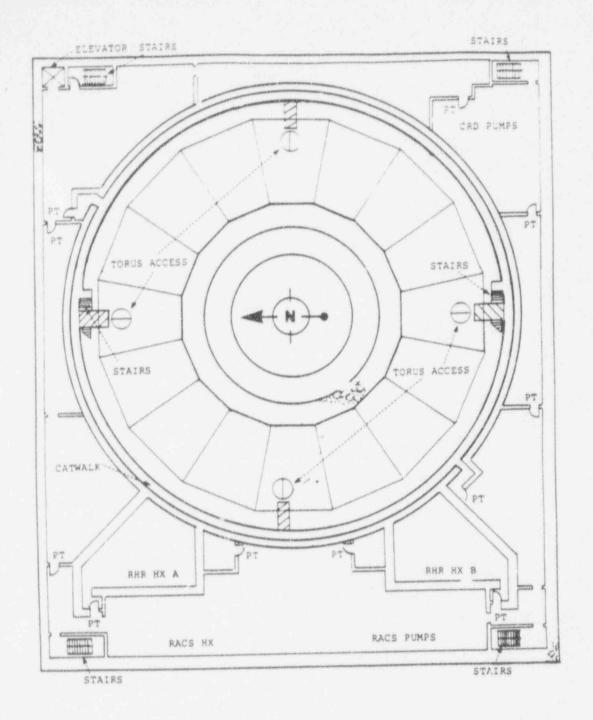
Reactor Building Shielding and Radiation Zoning Drawing Plan Elevation 77'-0"
